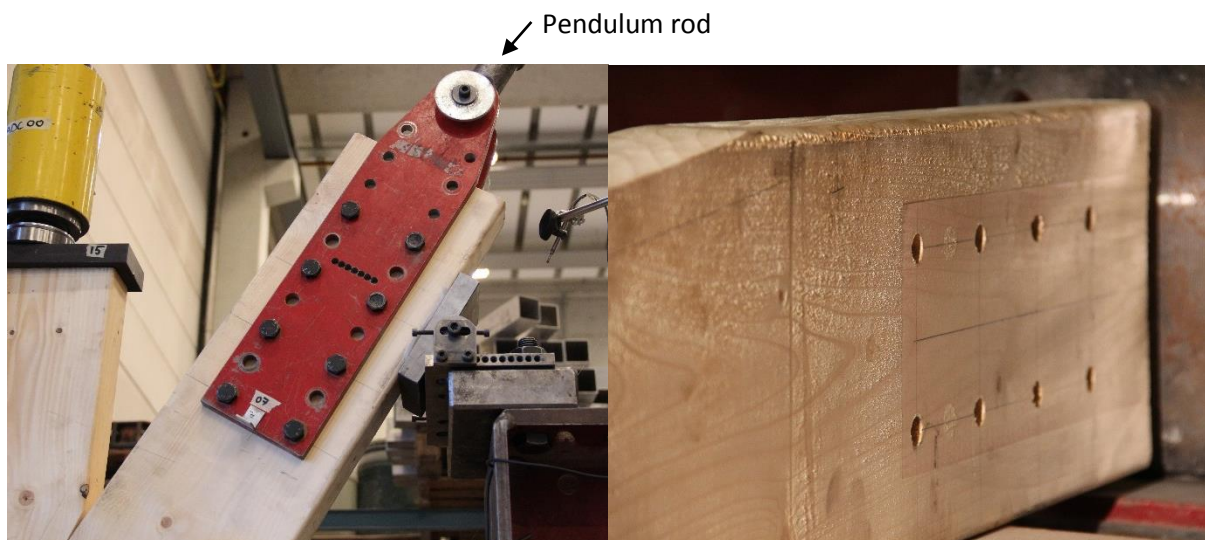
a) Bolted steel to timber connection with 4x2 M16 bolts b) Result of tightening of the bolts
